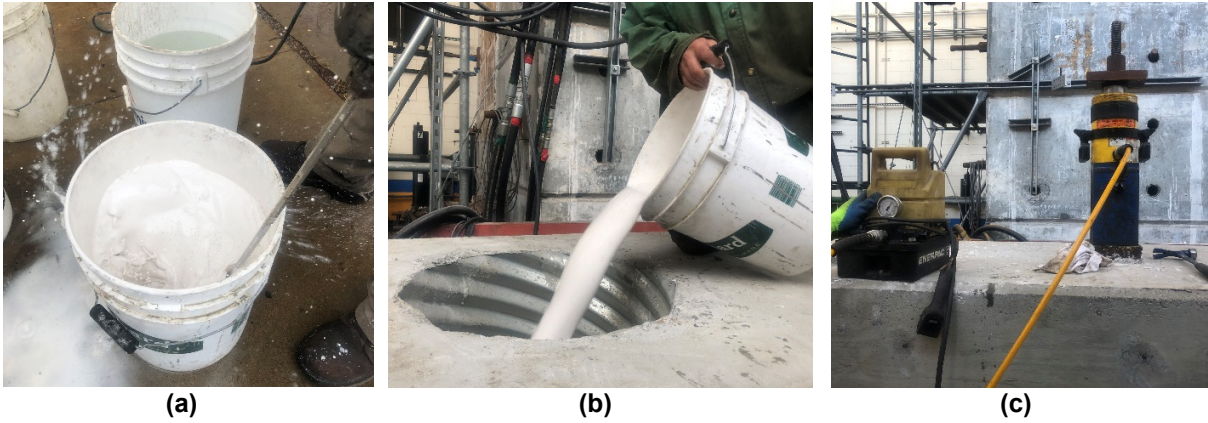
(a) Mix the hydro-stone; (b) place the hydro-stone through corrugated metal pipes; and (c) prestress the foundation to the supporting beam.
